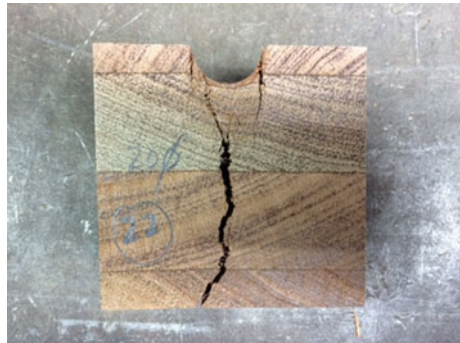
Typical failure of the specimens using 16 mm dowel diameter
